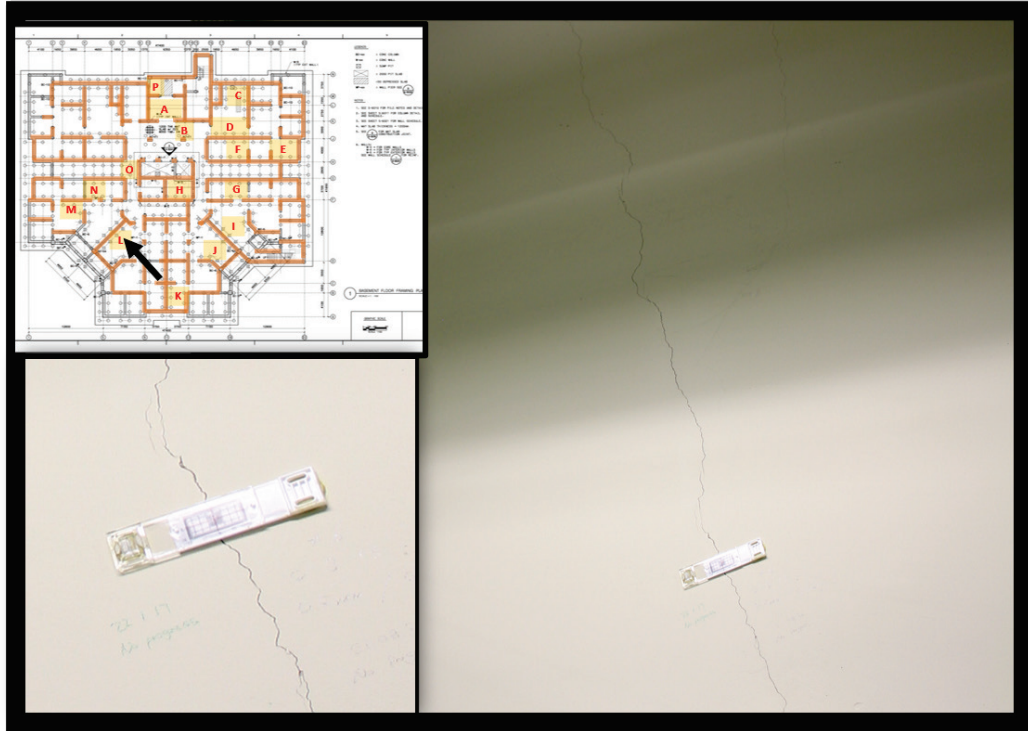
Typical observed diagonal cracking within the Tower 2 basement storage area (Section E of the floorplan insert). The widest area of the typical observed crack was less than 0.40 mm and did not intersect the floor slab. The crack shown here has been repaired; however, it is typical of orientation, location, and size of the Tower 2 diagonal cracking.
